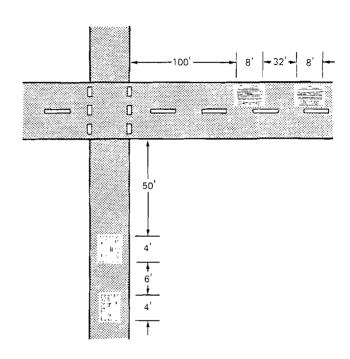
Intersection pavement markings—designated bicycle lane with left turn area, heavy turn volumes, parking, one-way traffic or divided roadway.
